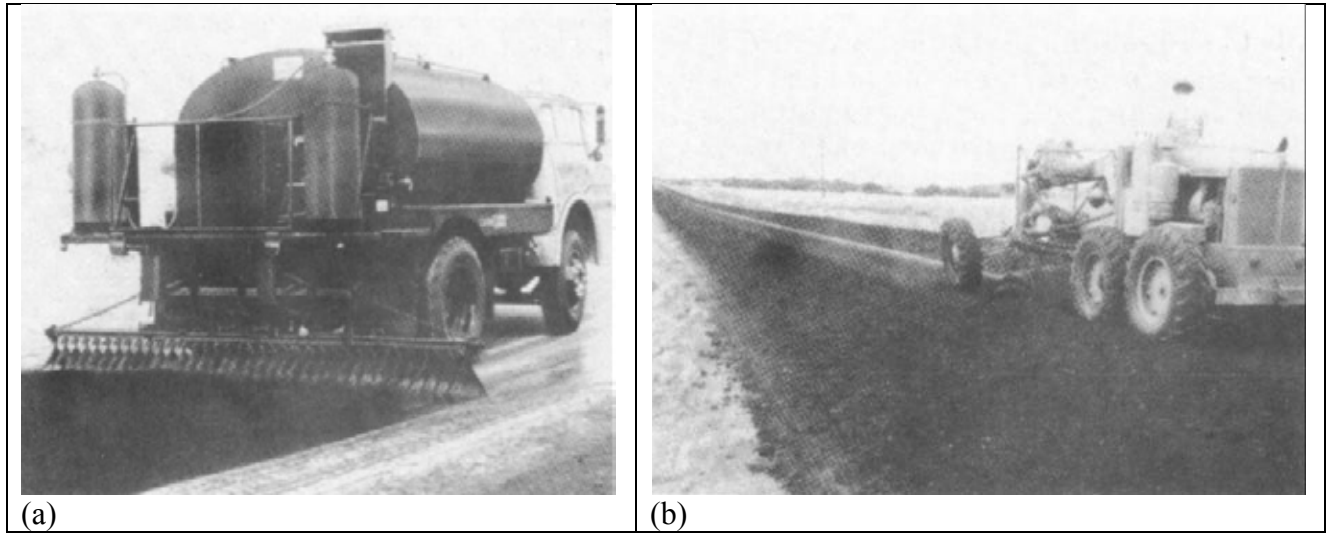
Steps for bitumen stabilization at construction site (a) Bitumen spreading (b) Bitumen mixing with soil (Photos courtesy of US Army Technical Manual [13]).
